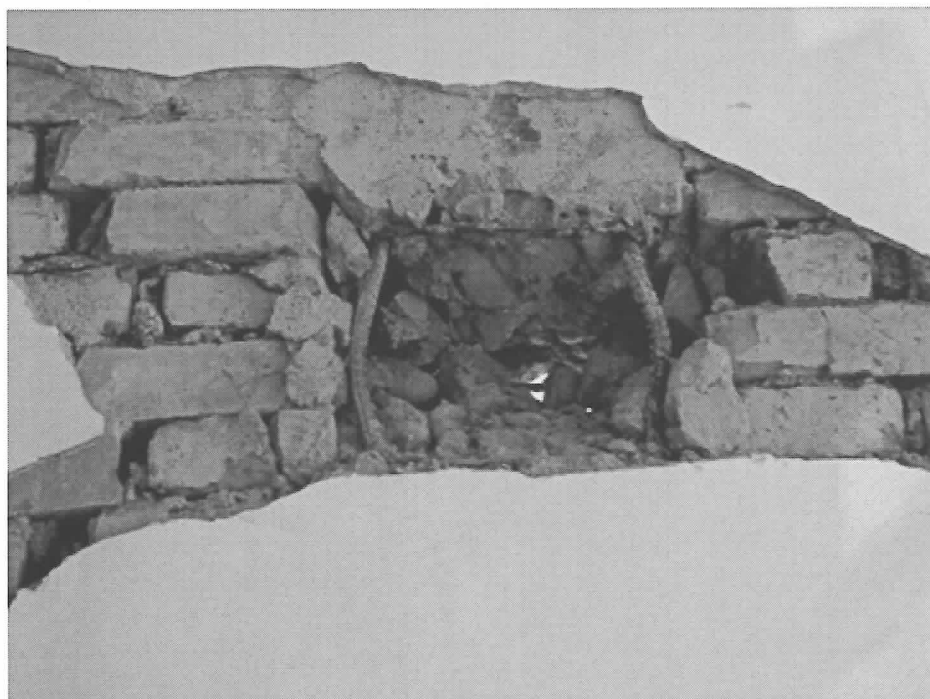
Destruction of structural central column of masonry structure in Mianzhu
